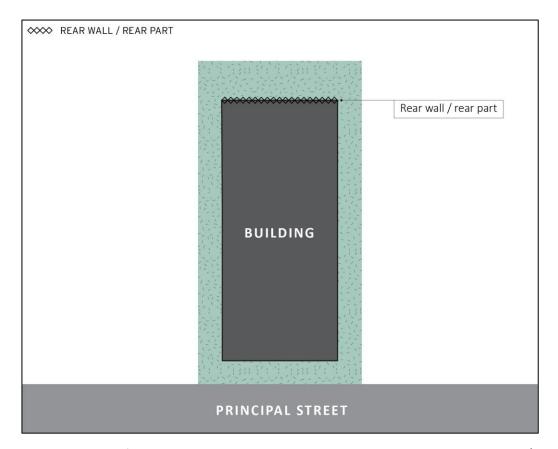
Modifications and alterations, including demolition, are exempt to the rear wall/rear part of building
